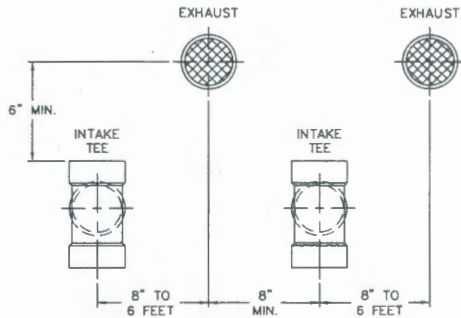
Vent Pipe Spacing for Multiple PUREFIRE Boilers
